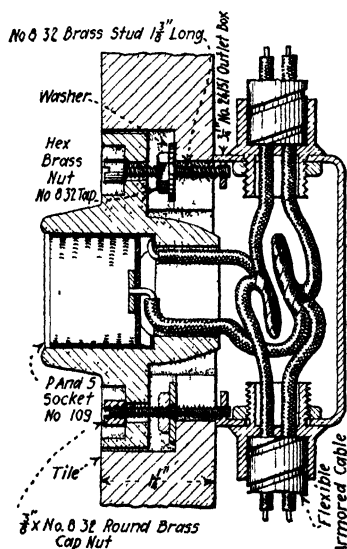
Sectional detail on line A-A of Fig. 377 showing socket, box and conduit in position on tile.
